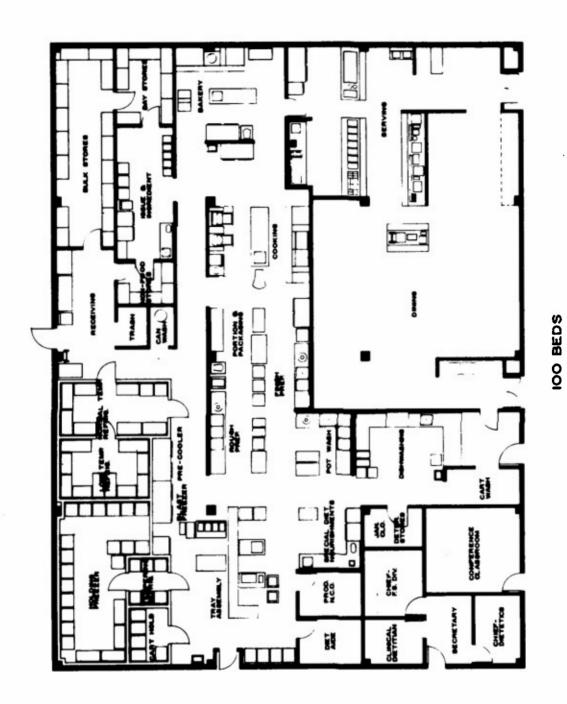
Kitchen and Dining Hall Layout - 100-Bed
